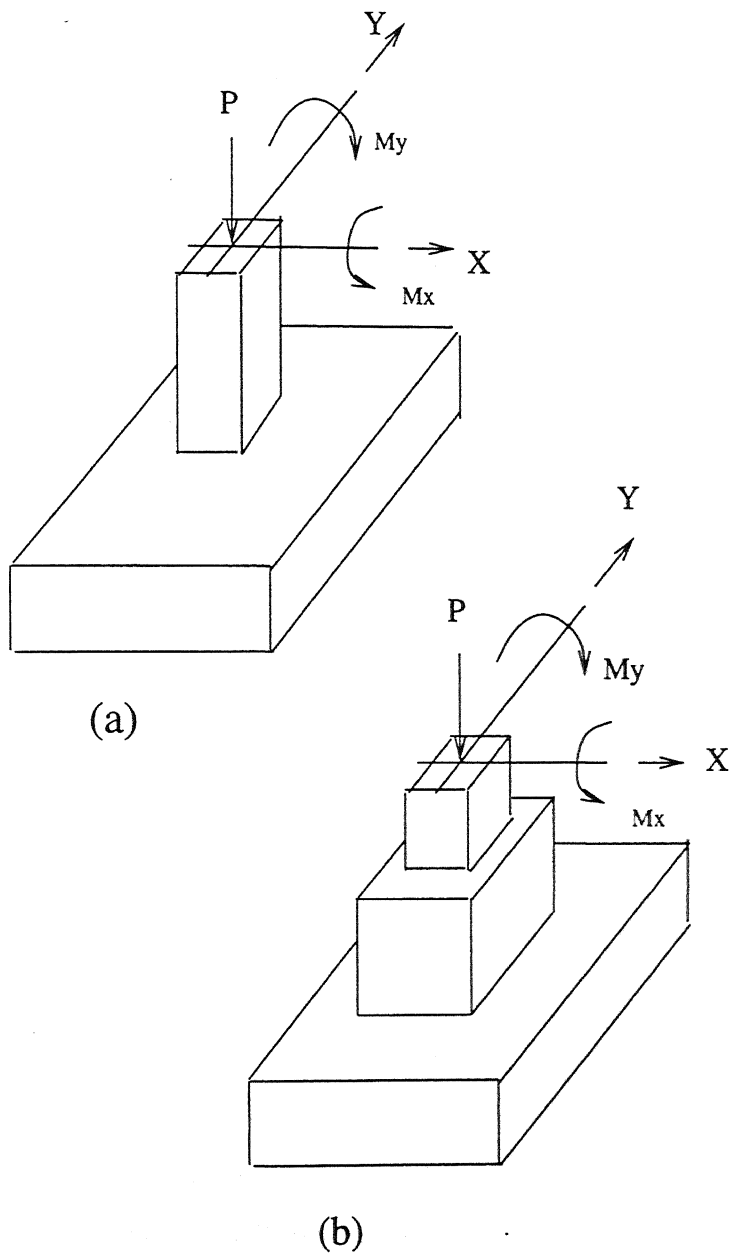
Enlarge view of loading, (b) steel column, (a) concrete column
